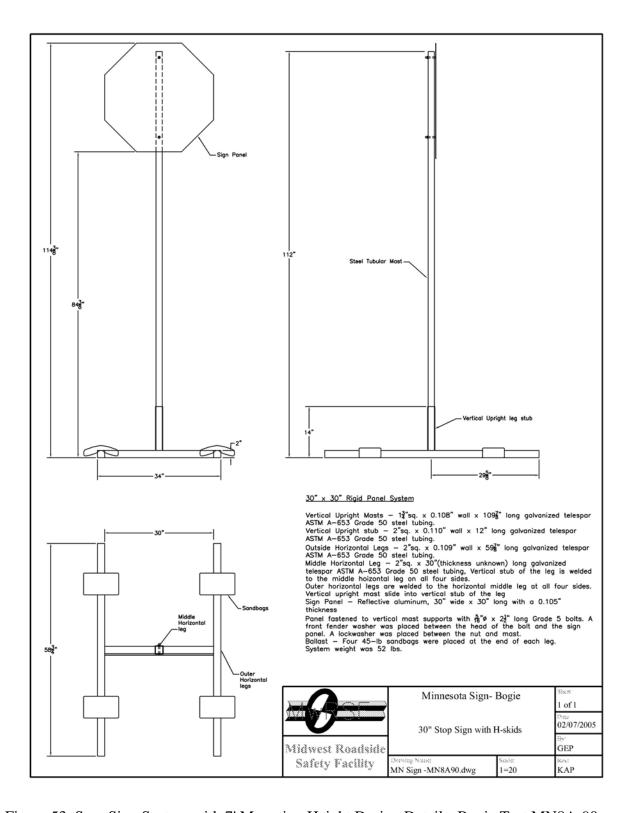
Stop Sign System with 7' Mounting Height Design Details, Bogie Test MN8A-90
